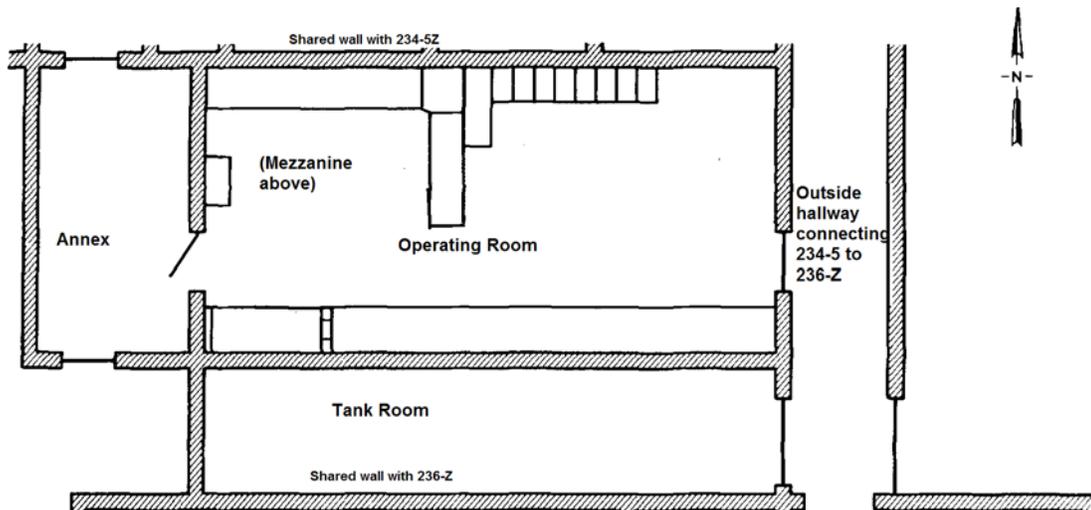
Floor Plan of the 242-Z Building and Nearby Structures
